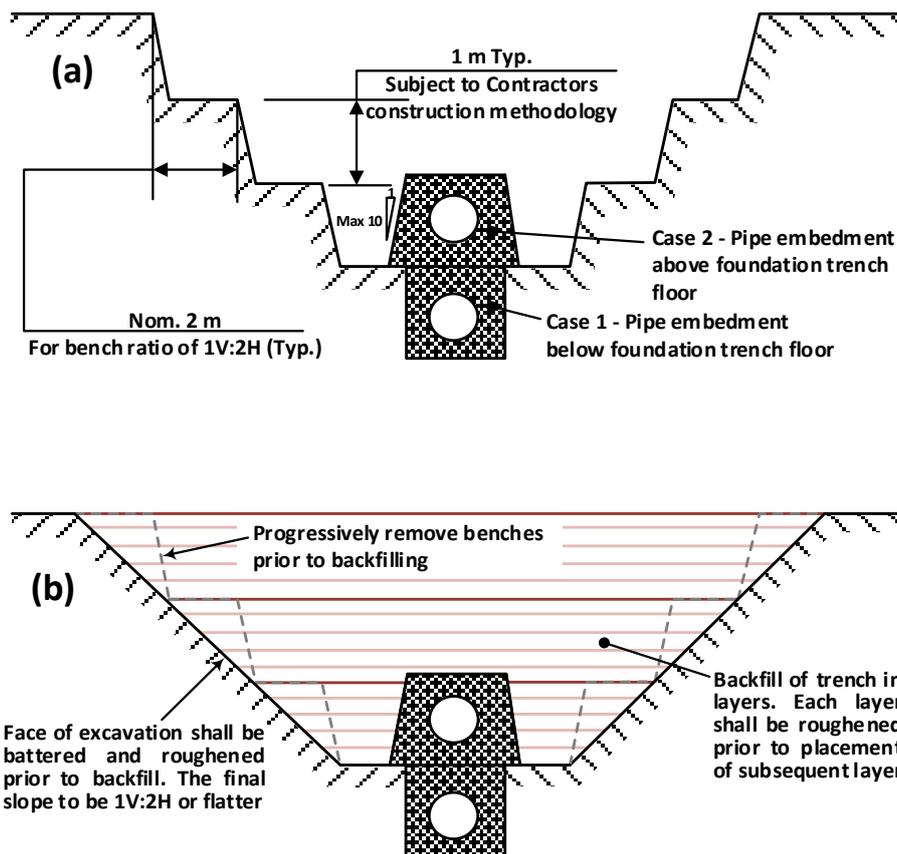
An example of (a) benched embankment excavation for pipe penetration, and (b) backfilling around and on top of the pipe embedment zone with progressive battering
